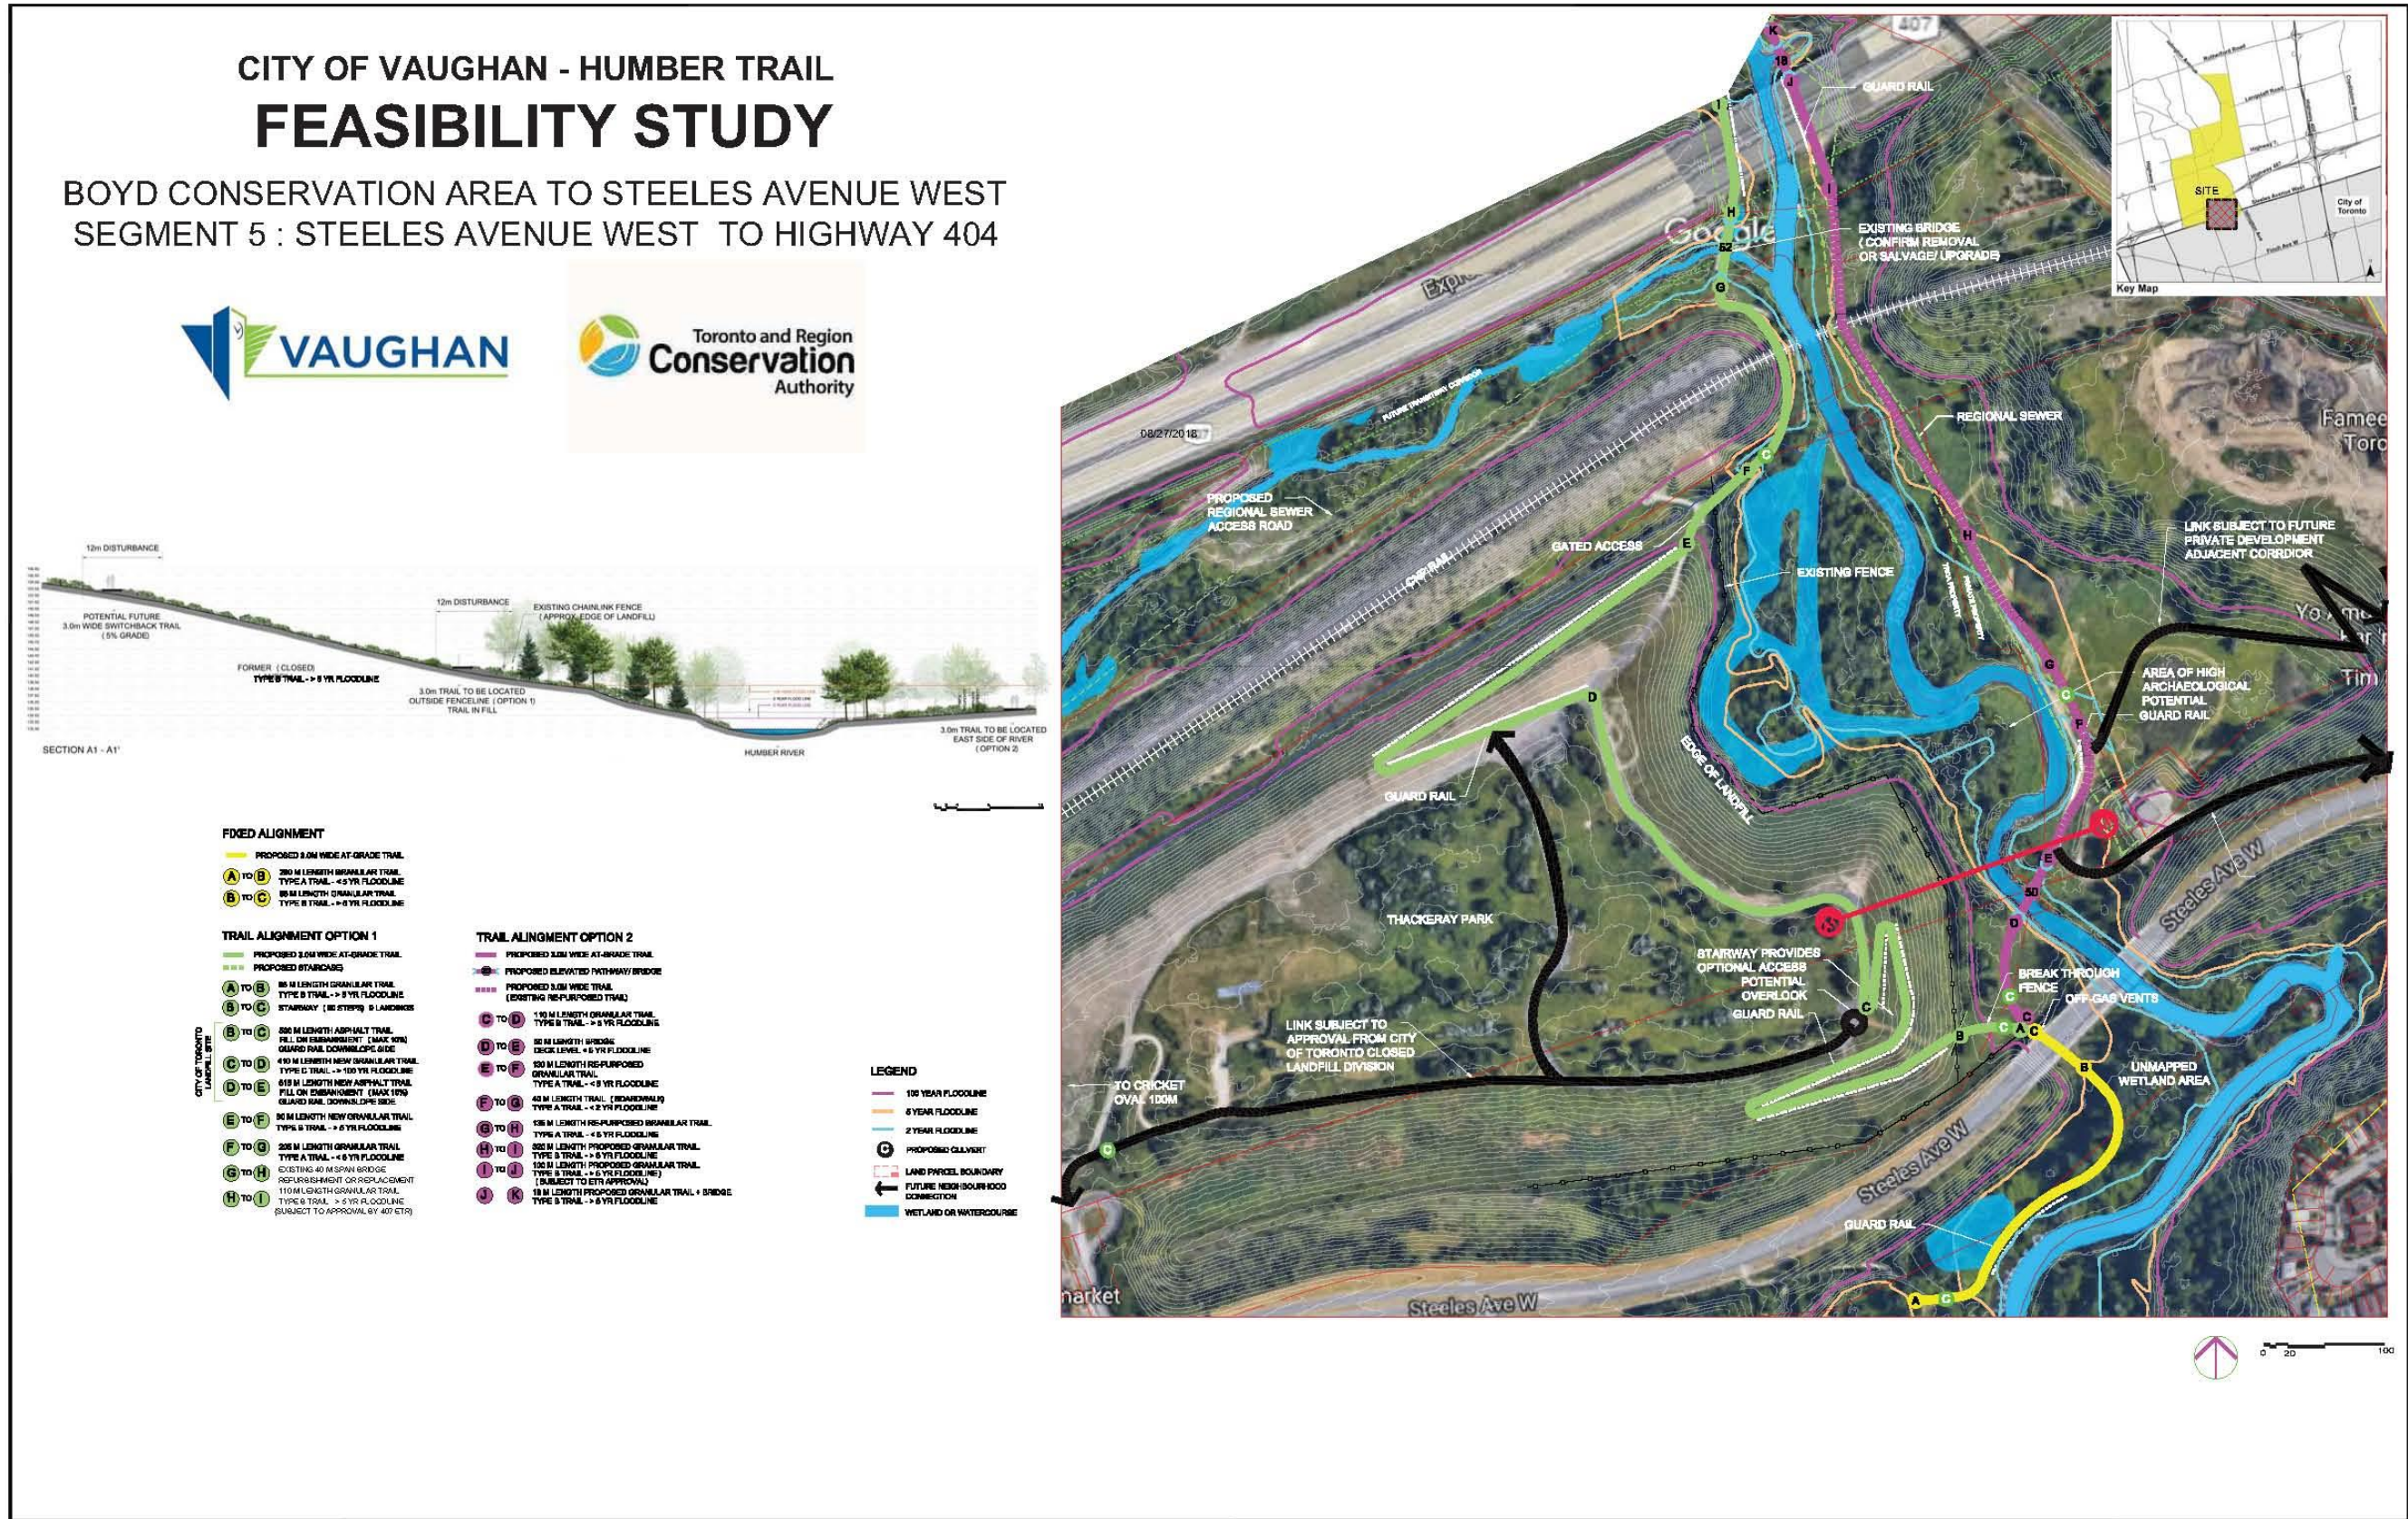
Segment 5: Steeles Avenue West – Highway 407
